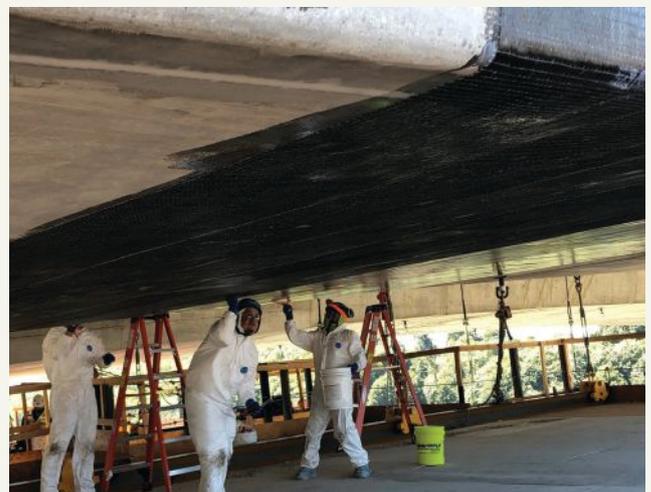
Carbon-fiber-reinforced polymer (CFRP) being installed to strengthen a concrete segmental bridge. Proper design, detailing, and installation is required for a CFRP strengthening system. Photo: Structural Technologies.
